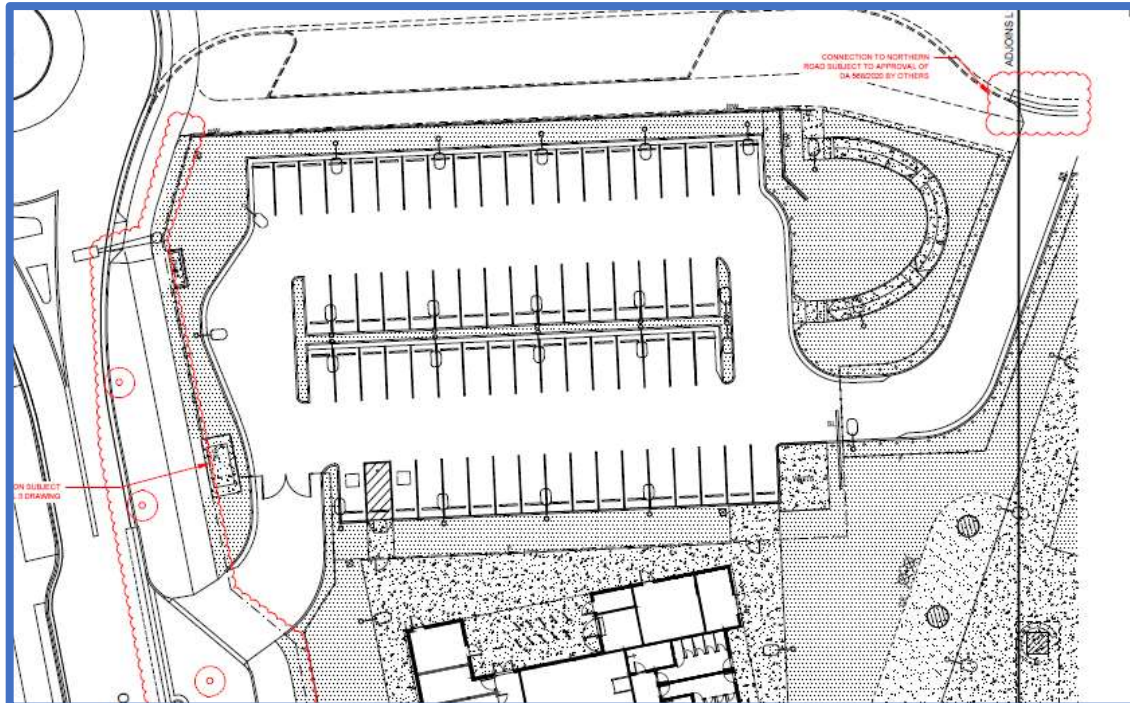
Mod 2 plans showing proposed pedestrian and vehicular access to LS1.
